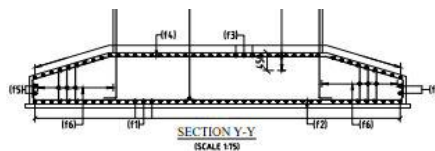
Sectional details of Pier Foundation along Longitudinal Direction
